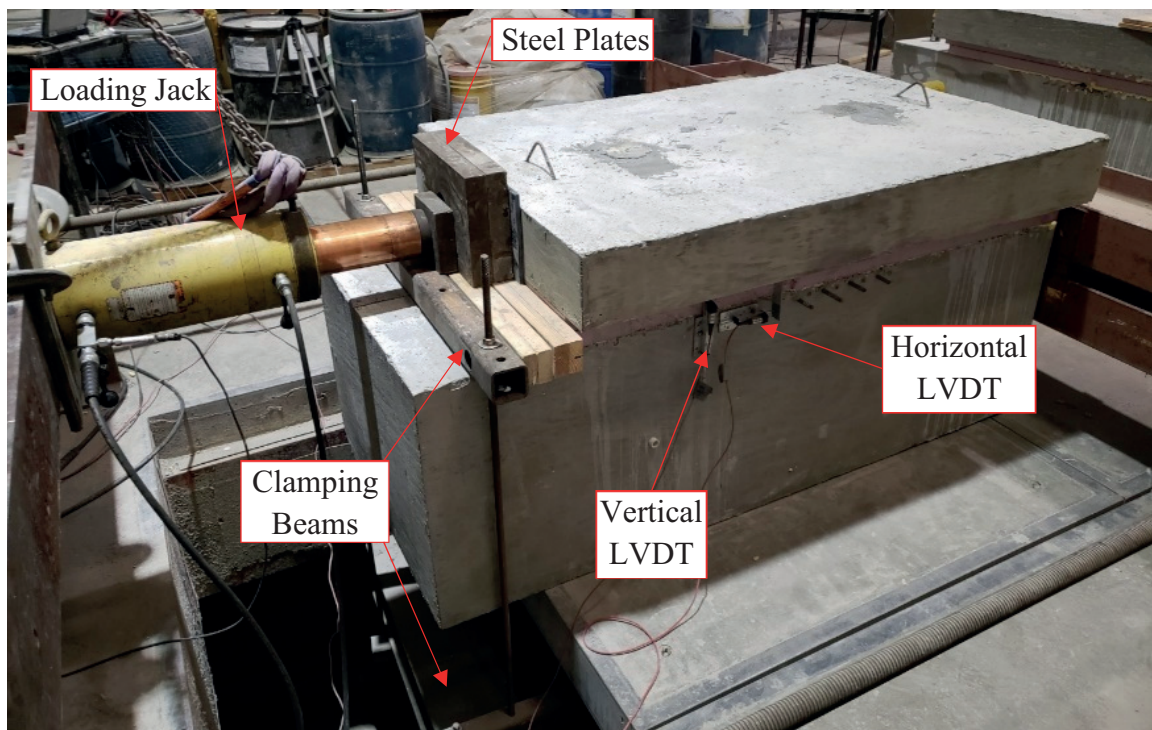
Full-Scale Push-Off Specimen Test Setup.
